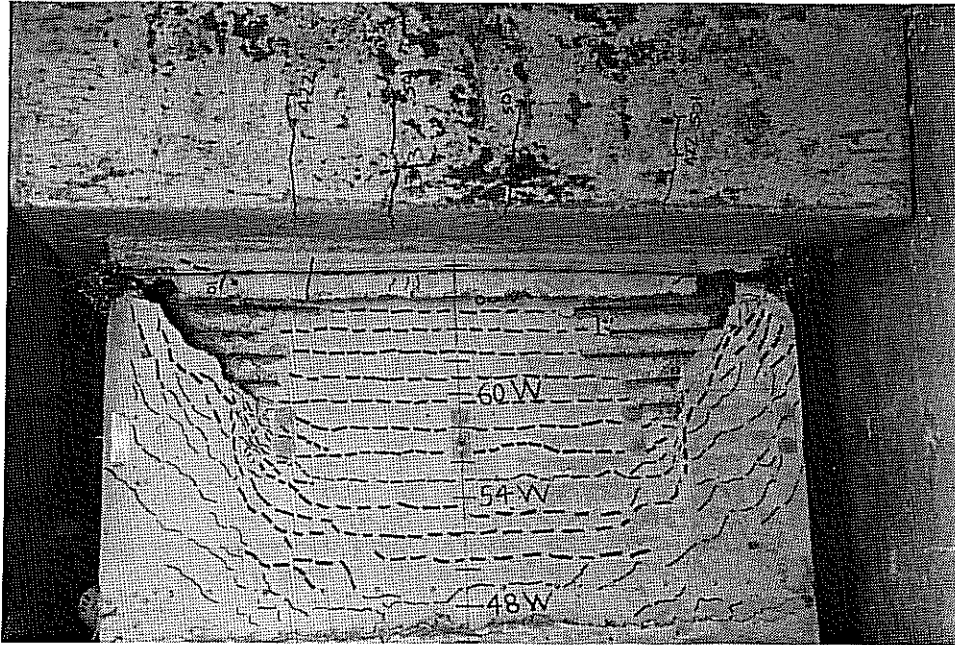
Specimen 11ML34 Compression Flange Close-Up
